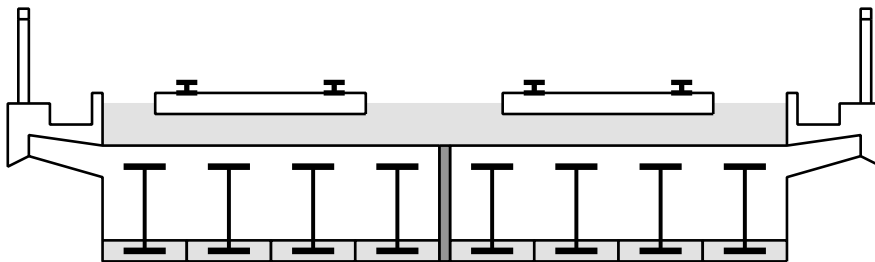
Investigated railway bridge: cross-section of the bridge deck
